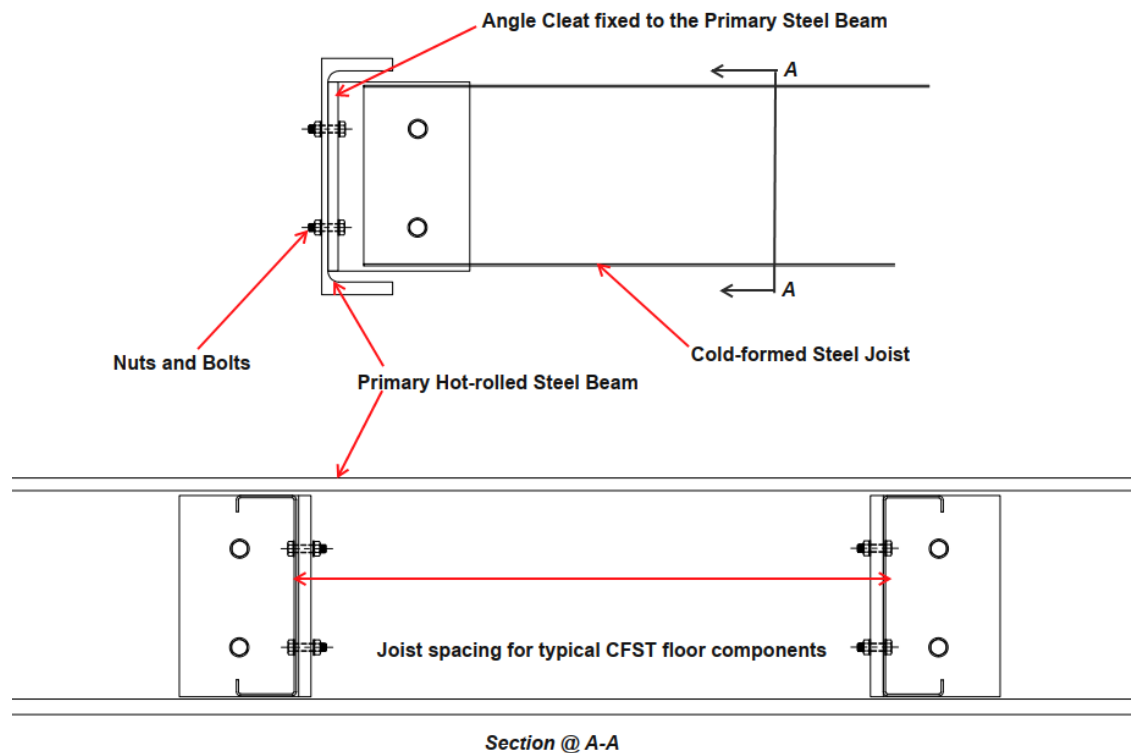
Typical connection methodology for the CFST floor components to the primary steel beam
